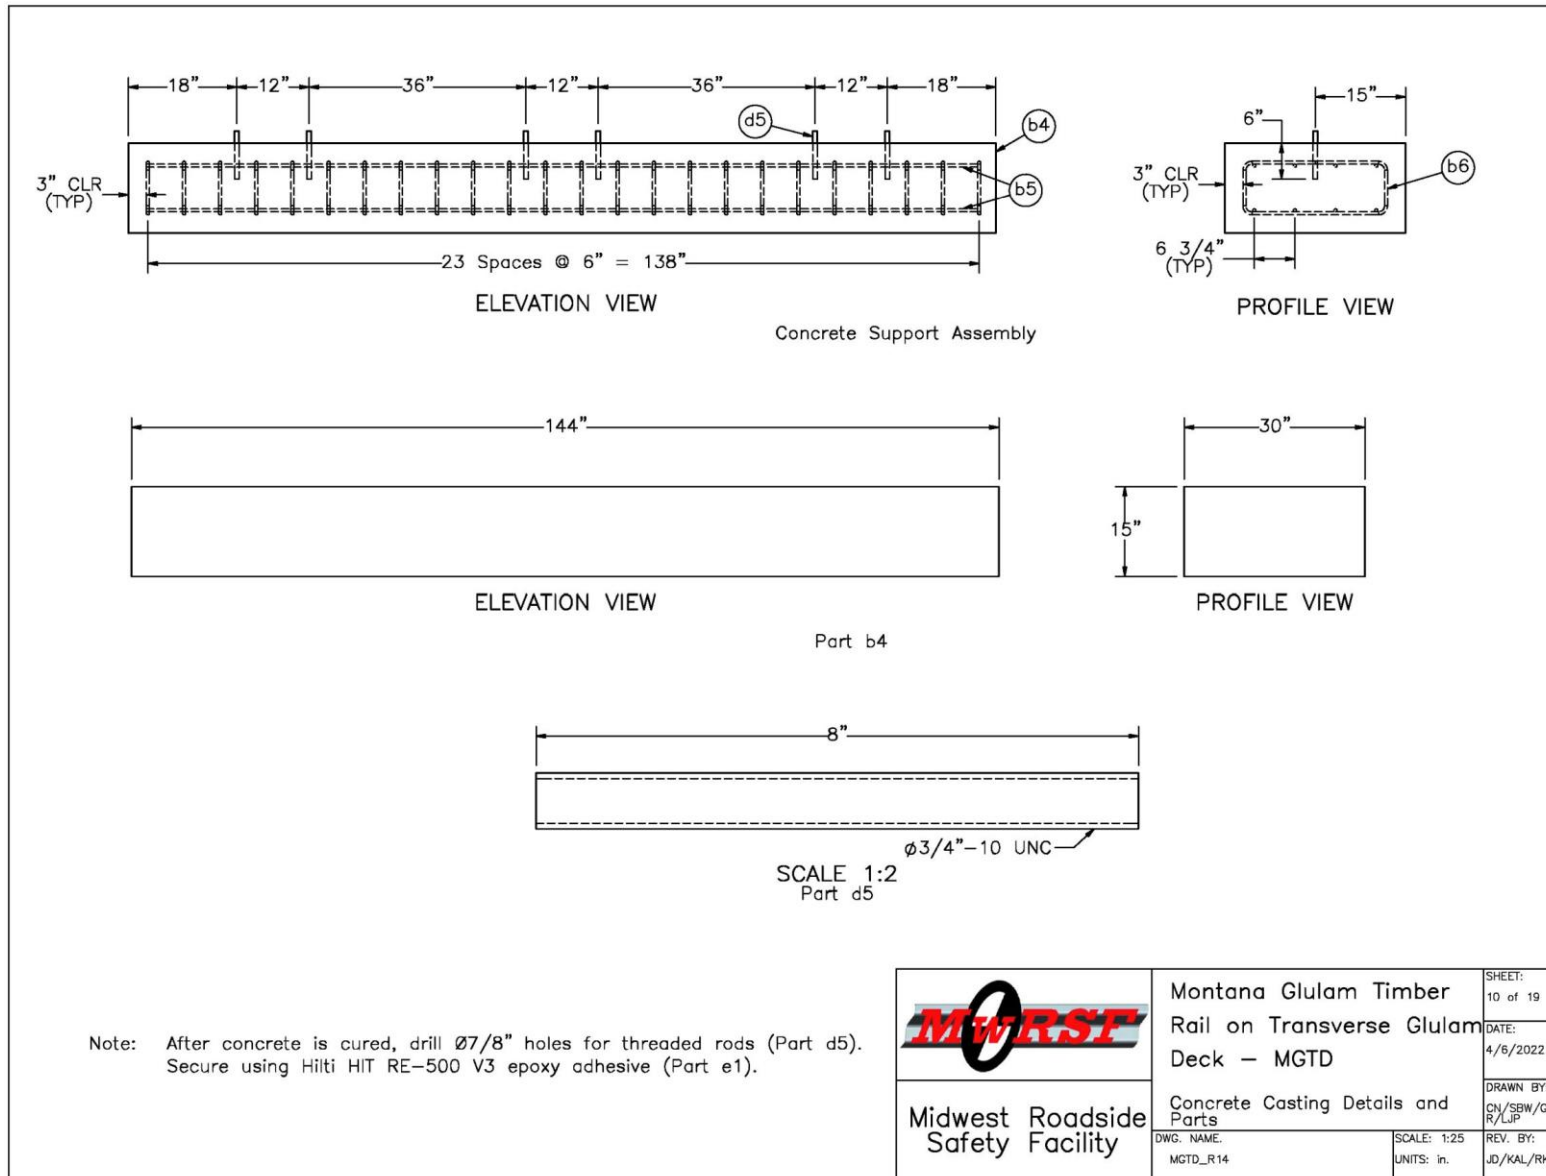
Concrete Casting Details and Parts, Test Nos. MGTD-1S and MGTD-1D
